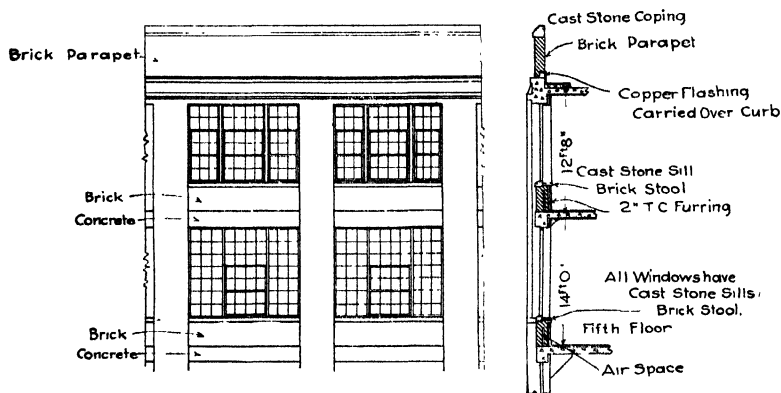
Elevation Showing Brick Veneer and Concrete Columns and Spandrel Beams; also Wall Section. (See p. 617.)
